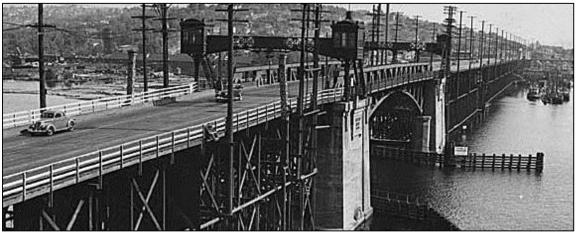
Existing conditions - narrow sidewalks on Ballard Bridge
